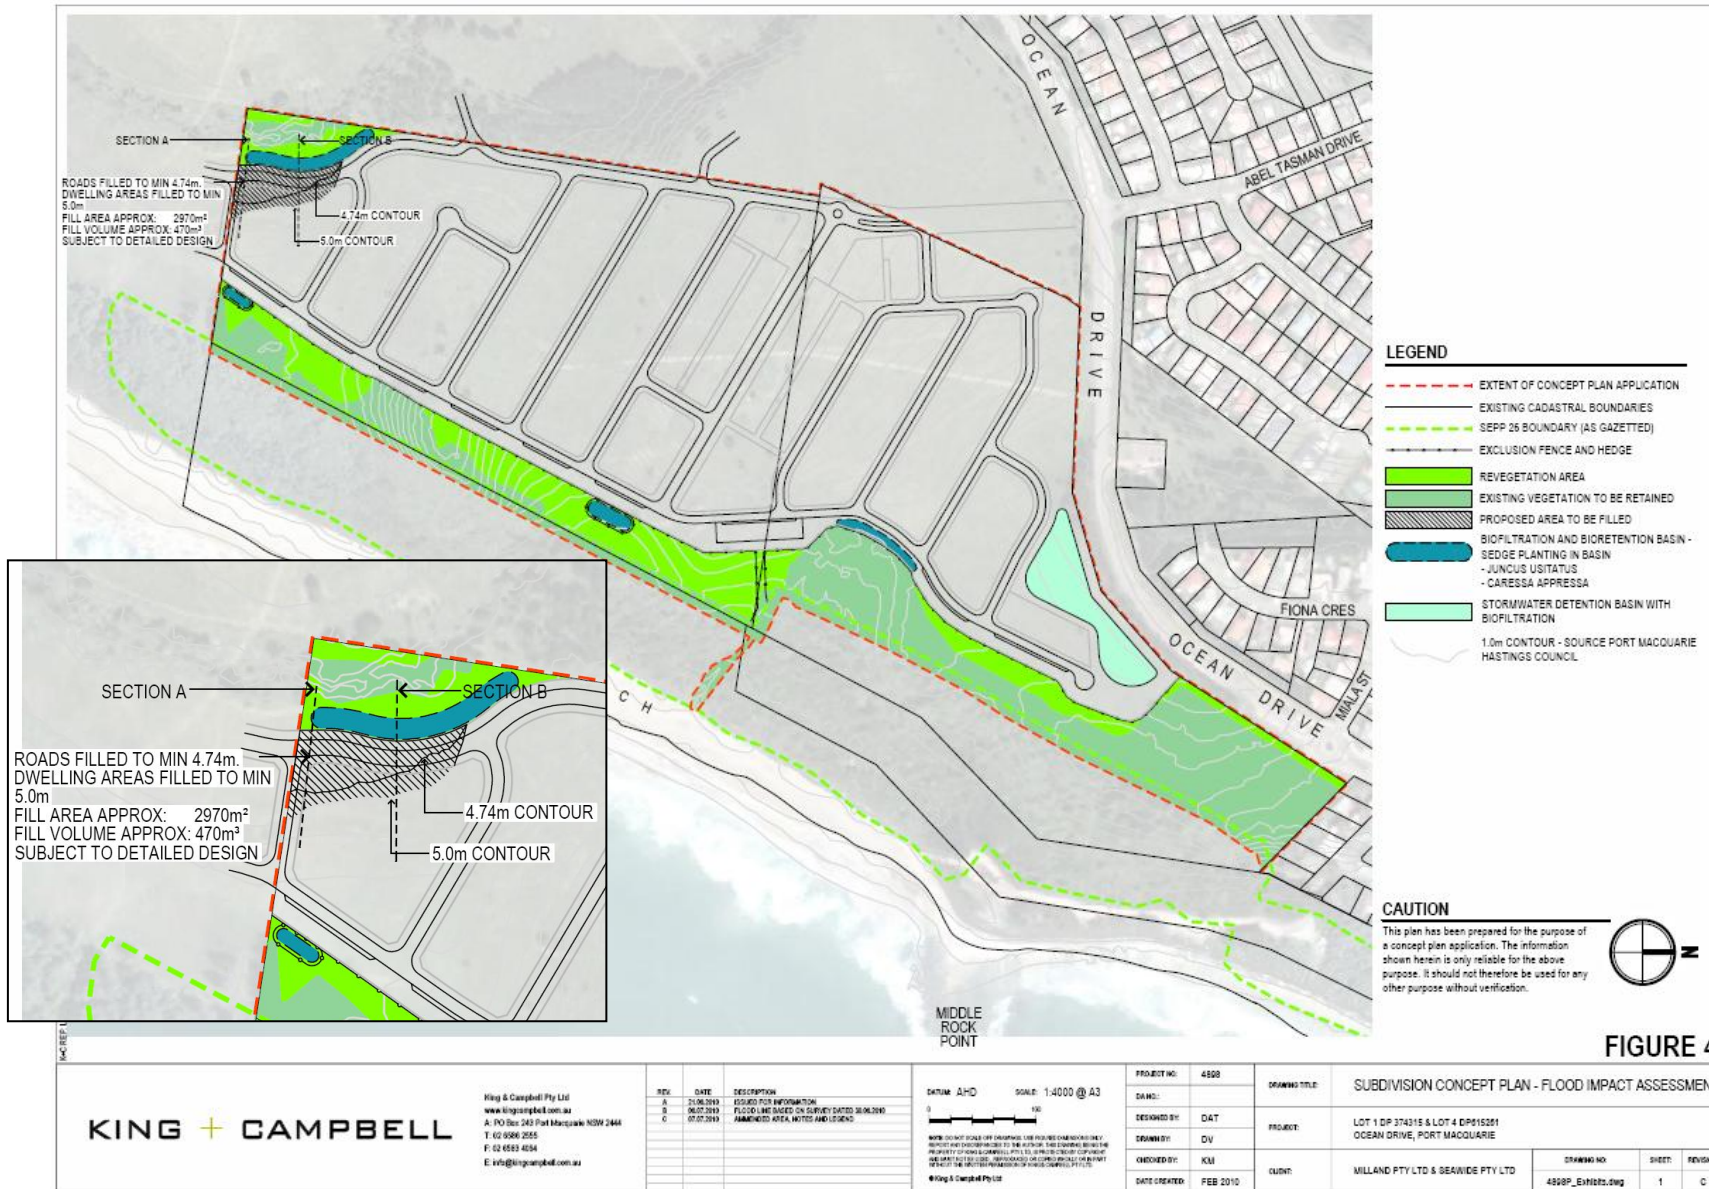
Subdivision Concept Plan - Flood Impact Assessment
